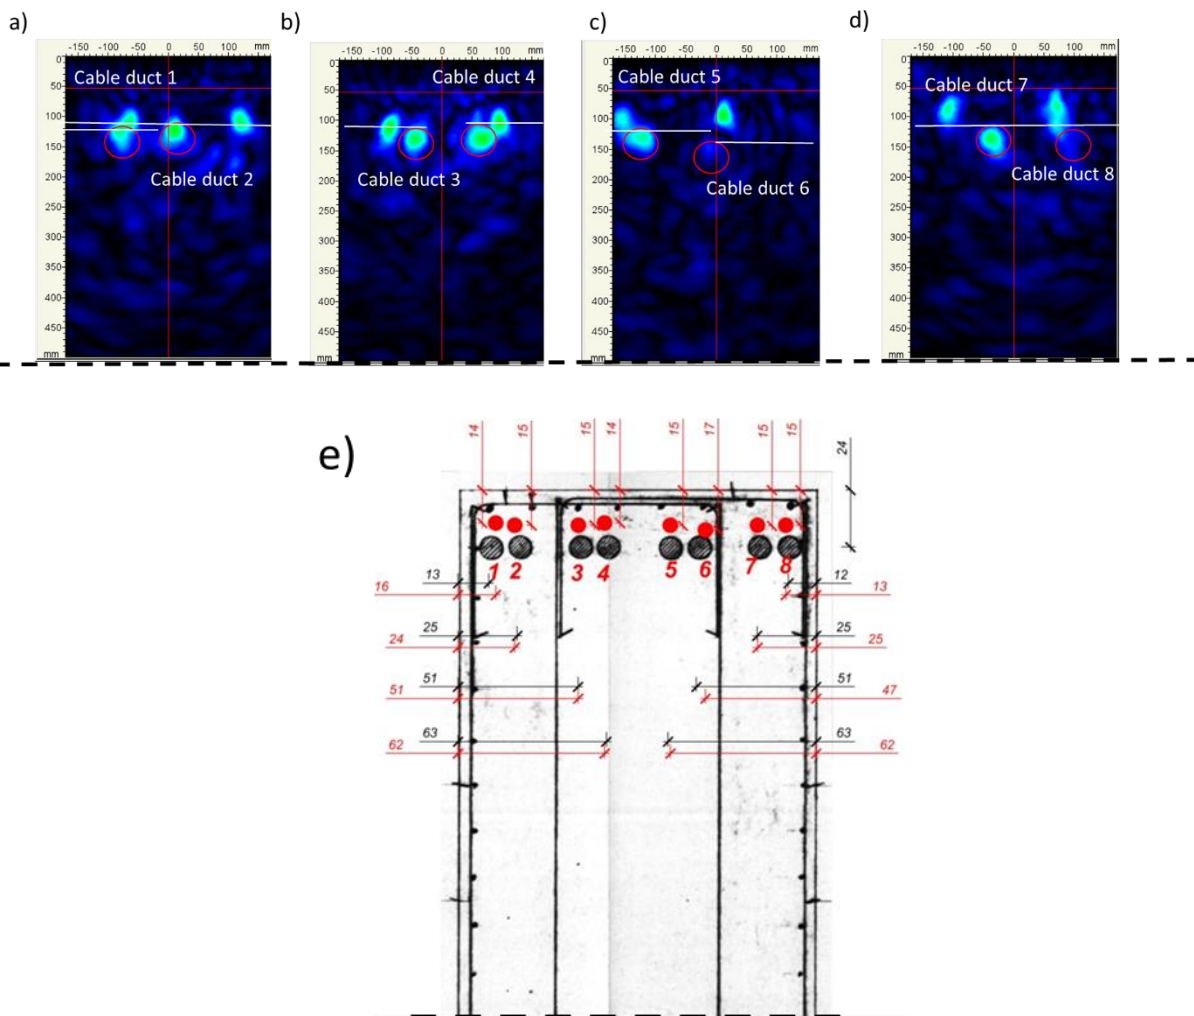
Examples of illustrating the position of prestressing cables in one of the tested post-tensioned concrete girders in cross section 7, cables 1 and 2 (a) cables 3 and 4 (b) cables 5 and 6 (c) cables 7 and 8 (d) and a comparative table of their location according to tests nondestructive red and according to the design documentation (black).
